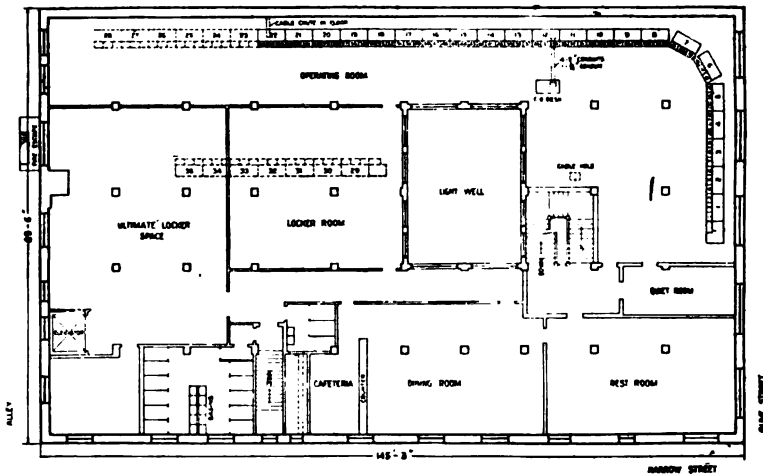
PLAN OF SECOND FLOOR OLIVE OFFICE, LOS ANGELES, CAL.
